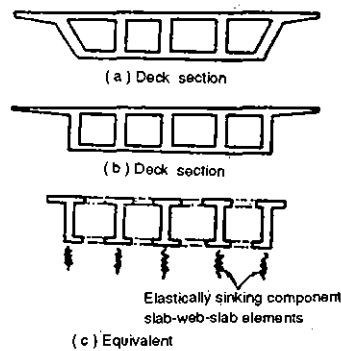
Deck section with vertical or nearly vertical webs, and equivalent slab-web, slab elements, interconnected and elastically sinking
